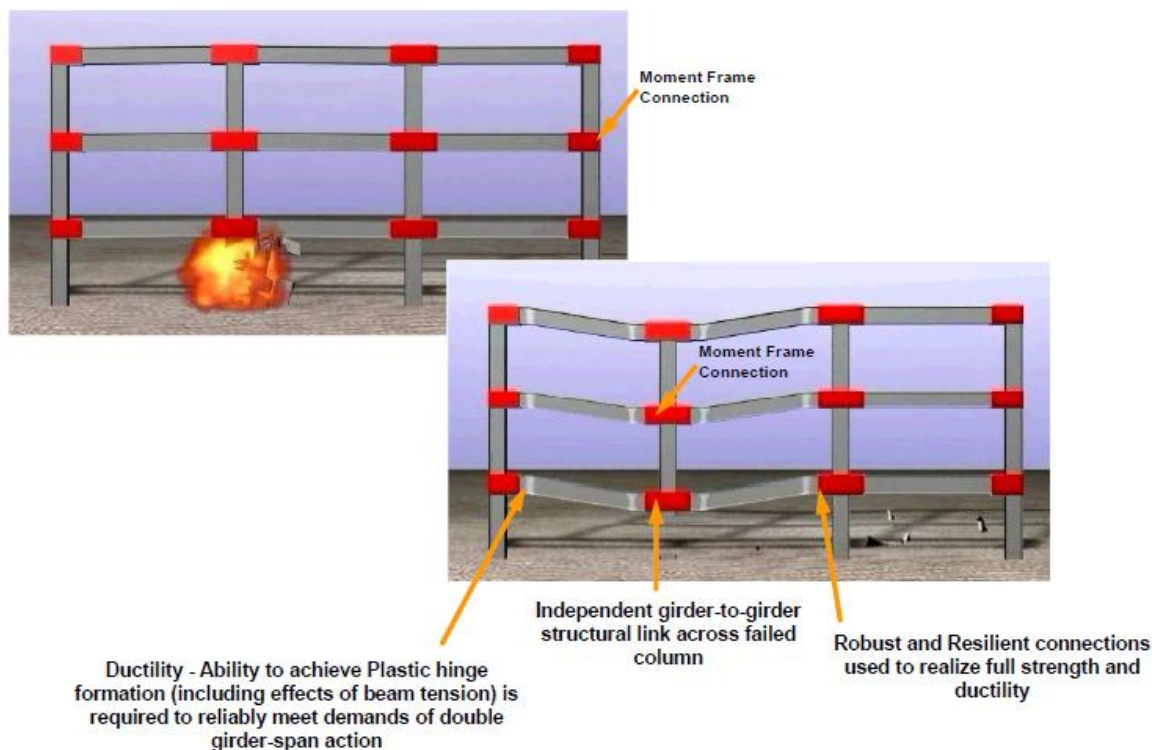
Alternative path method, example of removal column (www.sideplate.com).
